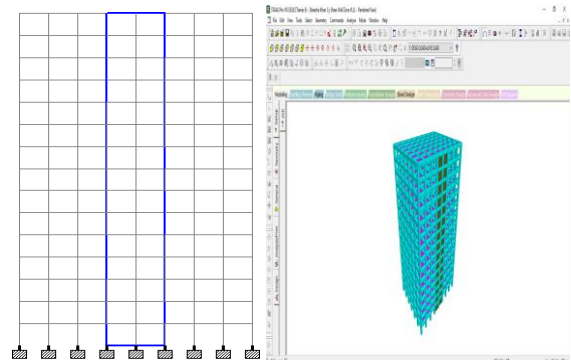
Framed building with Shear wall at the exterior side along Z-direction.
